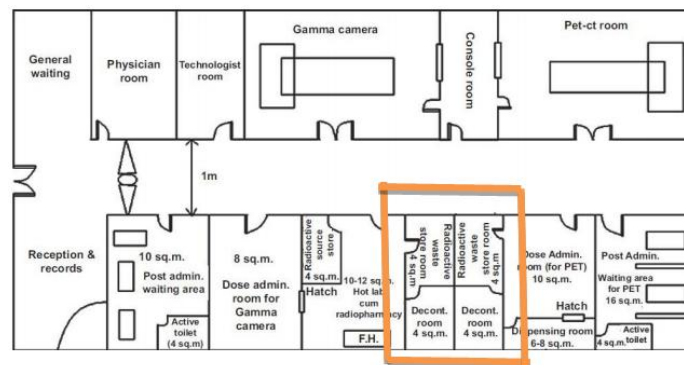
Typical Layout of Radiography floor showing recommended storage of Radio-Active waste
